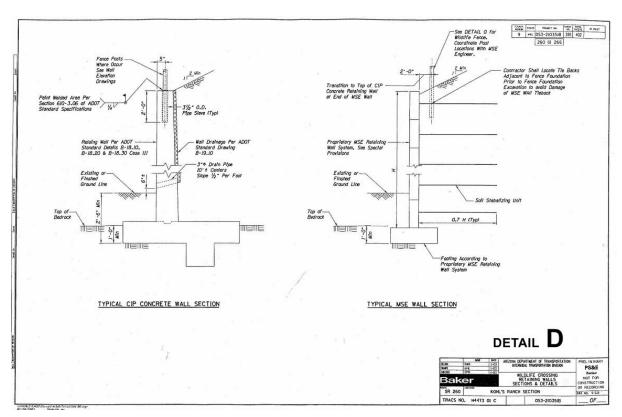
Arizona DOT Wildlife Crossing Retaining Walls Section
